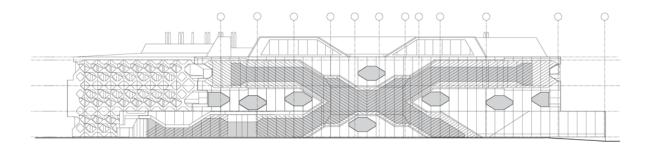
West Elevation (ArchDaily 2012)
